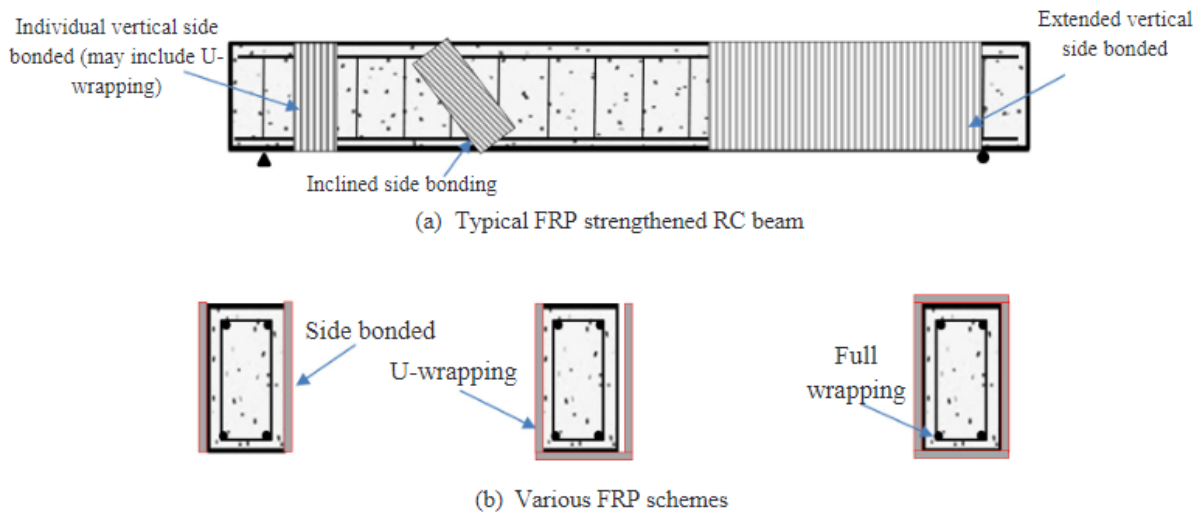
EBR-FRP strengthening of RC beams [1].
